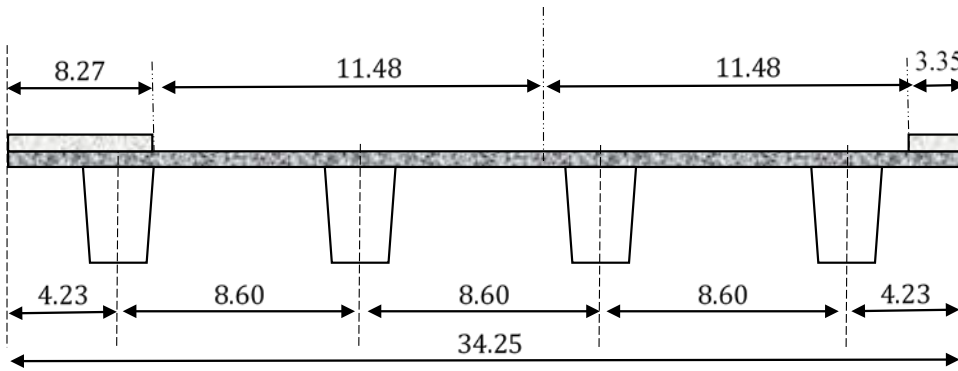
Cross-section of FRP U-girder bridge in Poland, dimensions in feet.
